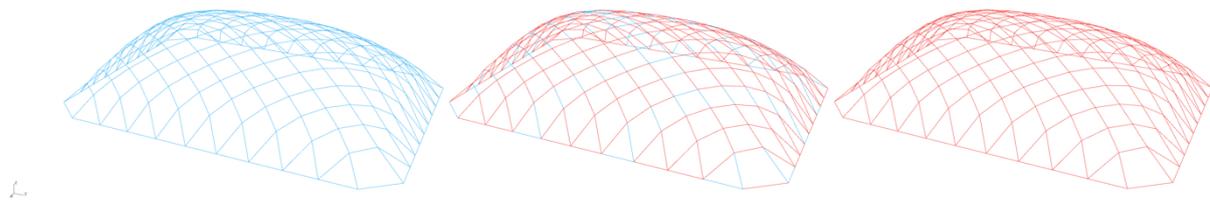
Constructive strategies, left to right: a) All bolted, b) proposed method, c) all welded
